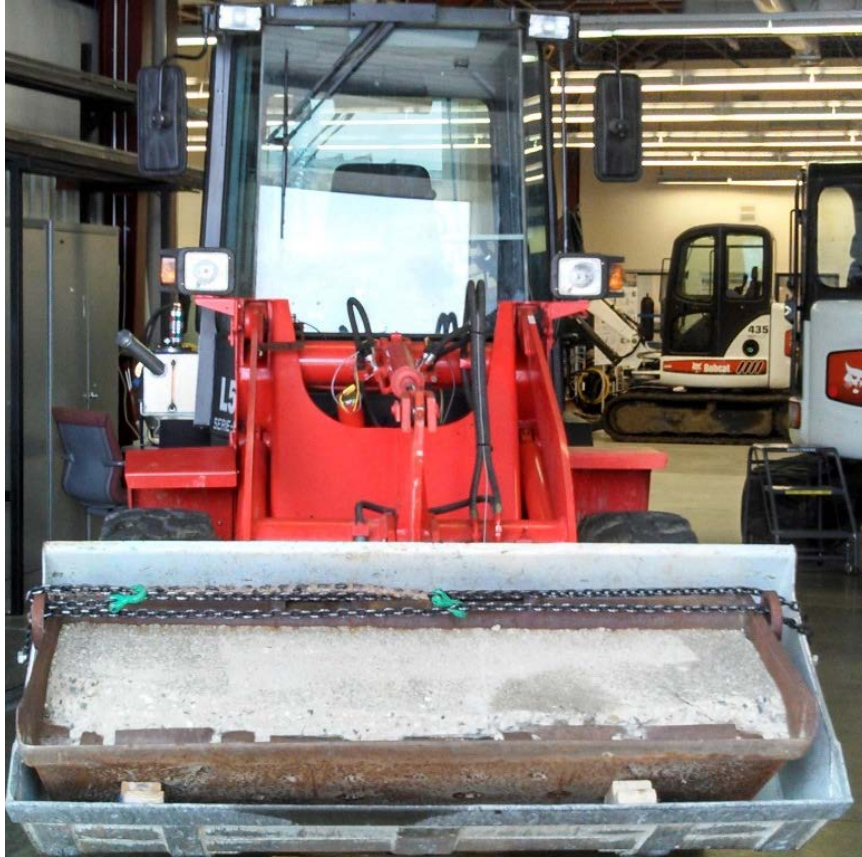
Dummy Concrete Load in the Loader's Bucket.
